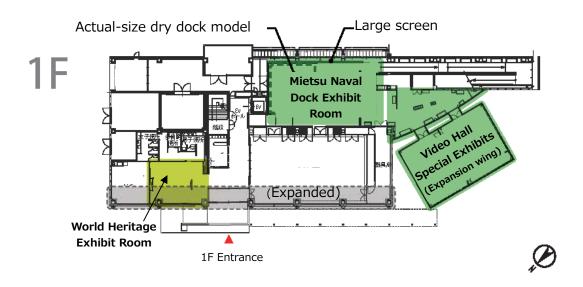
Exhibit zoning plan for each floor [Guidance Facility]
